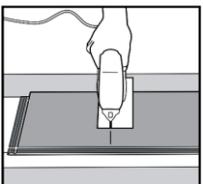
Cut with a jig saw – visual surface face turned down to eliminate/reduce damage to the face panel. Or if cutting using a hand saw /drop saw cut it with the visible face up. Then install it as previous plank.
